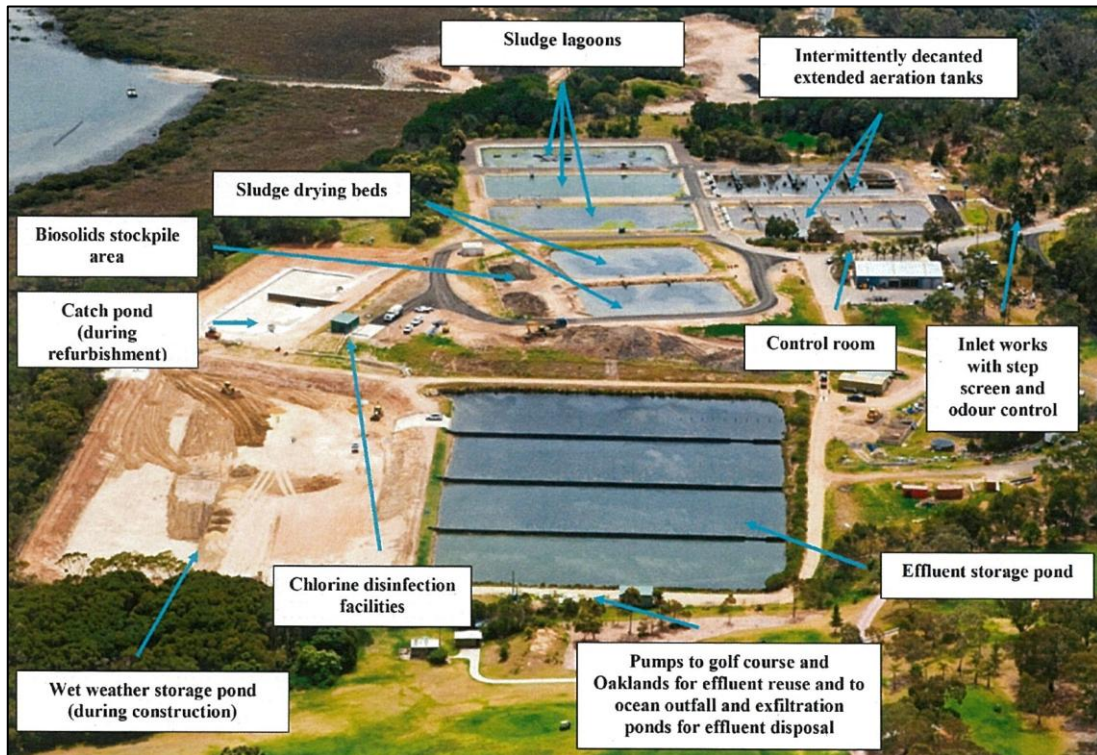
Merimbula STP - Site Layout (*image provided by BVSC*)
